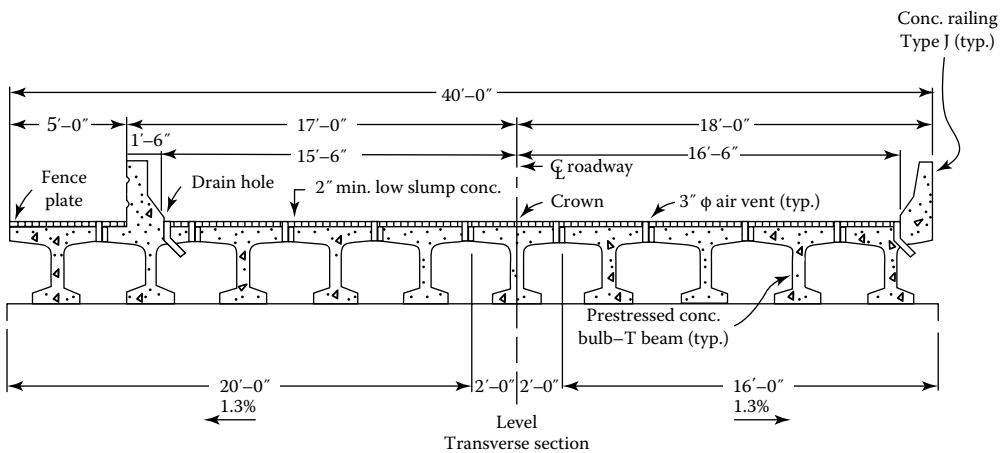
Superstructure system Type *j*: precast concrete single-T girders with shear keys, and with or without transverse posttensioning, and integral concrete deck.
